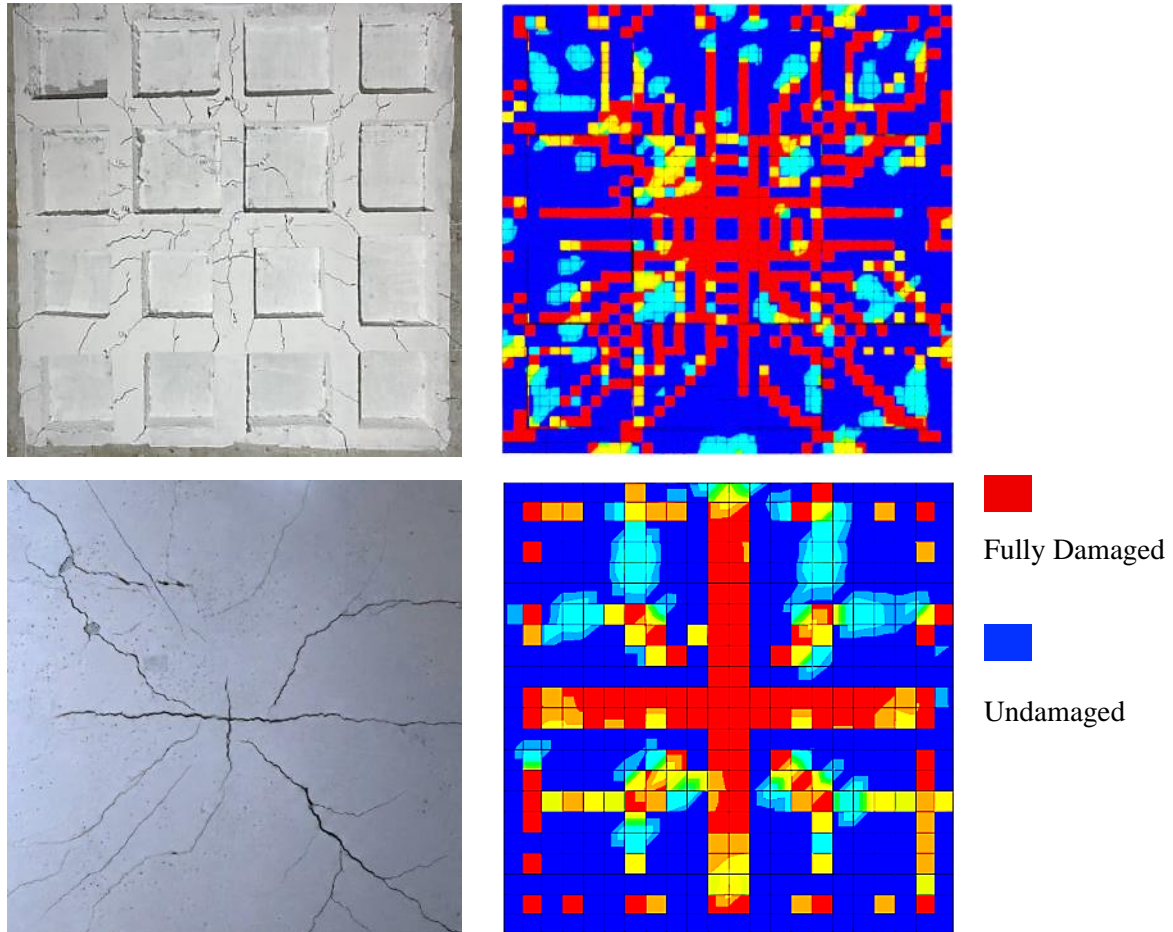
Crack pattern at ultimate load at bottom face for 1R-S-M and 0R-DI-G-D125-M specimens
